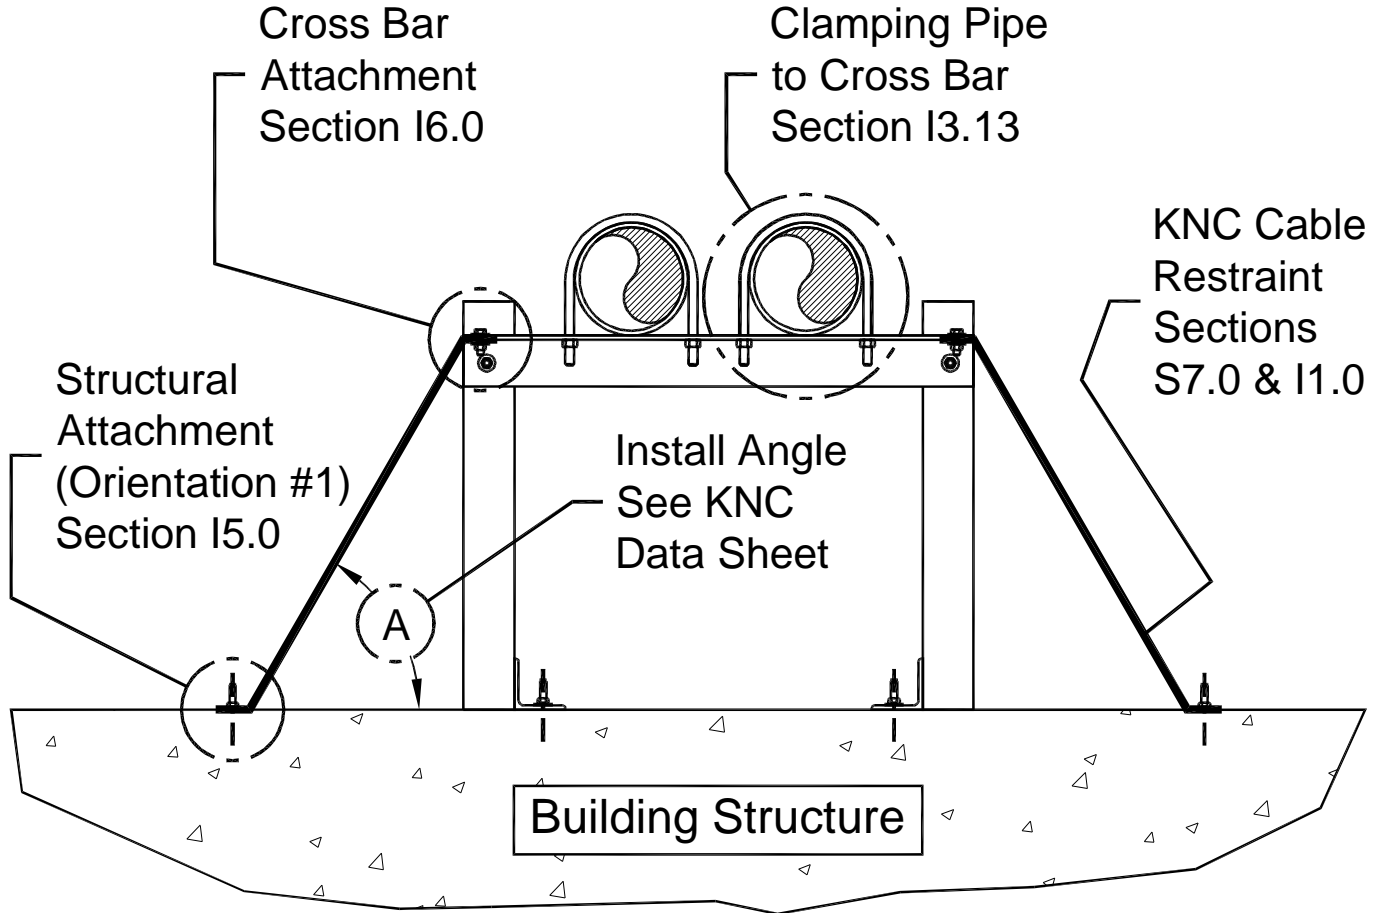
; Transverse (T) Cable Restraint Schematic Arrangement for Floor or Roof Mounted Pipe – One Restraint Attached to Each Side of the Cross Bar at the Vertical Legs Directed Outward from the Floor Stand
